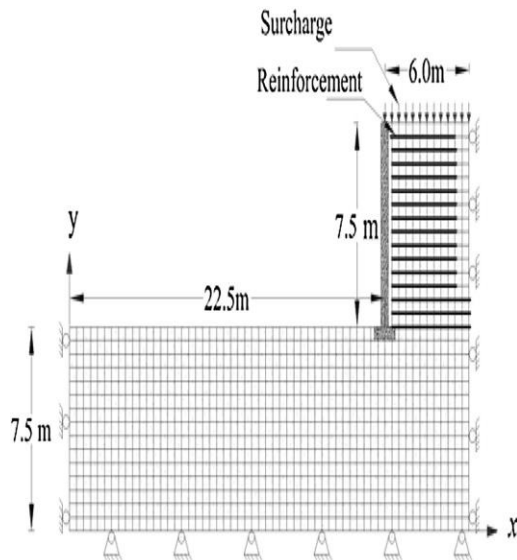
Typical finite element idealization of a rigid wall with a reinforced backfill
